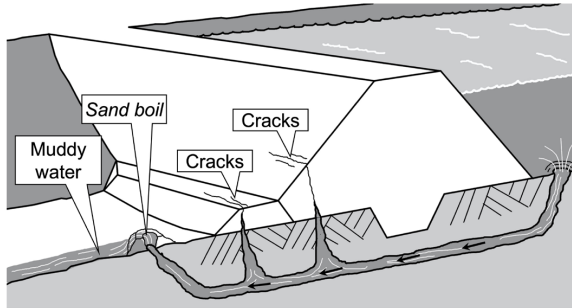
Piping in foundations. In foundations, the piping can manifest itself through downstream seepages with the presence of turbid water or the dragging of fines from the foundation, sand boils, and cracks on the embankment (FEMA, 2023).
